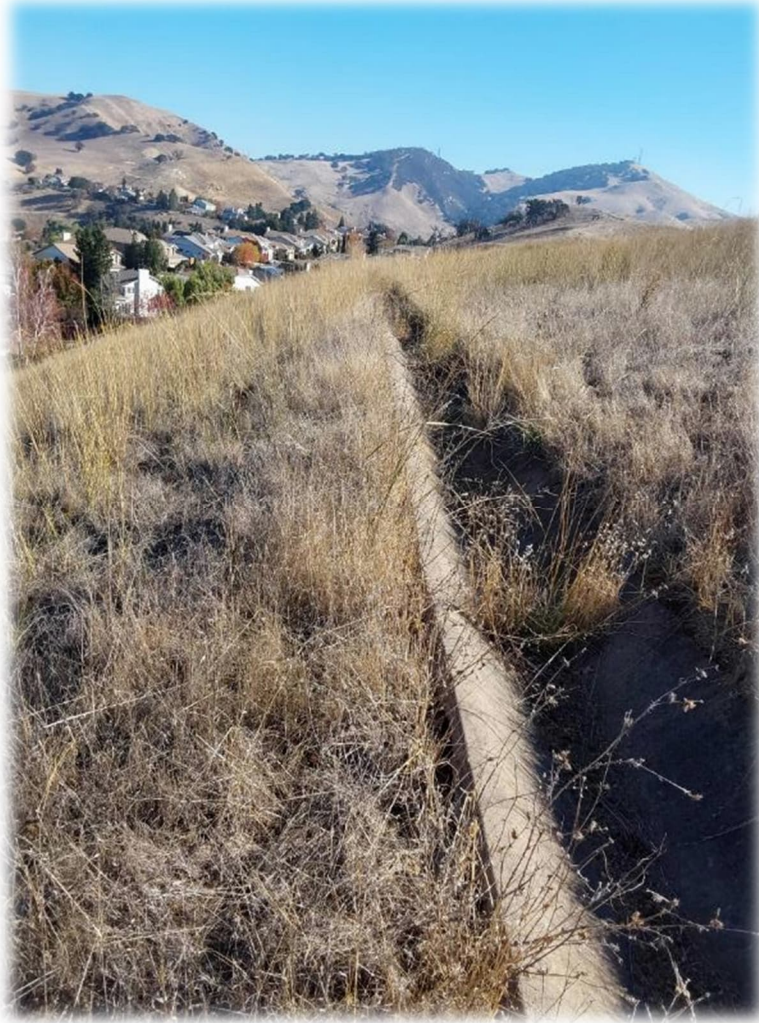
Similar conditions observed as noted in March 9, 2023 letter, Photo G: Slope creep depositing debris in V-ditch and resulting in minor cracking of V-ditch. Additional V-ditch cleaning and repairs should be performed.
